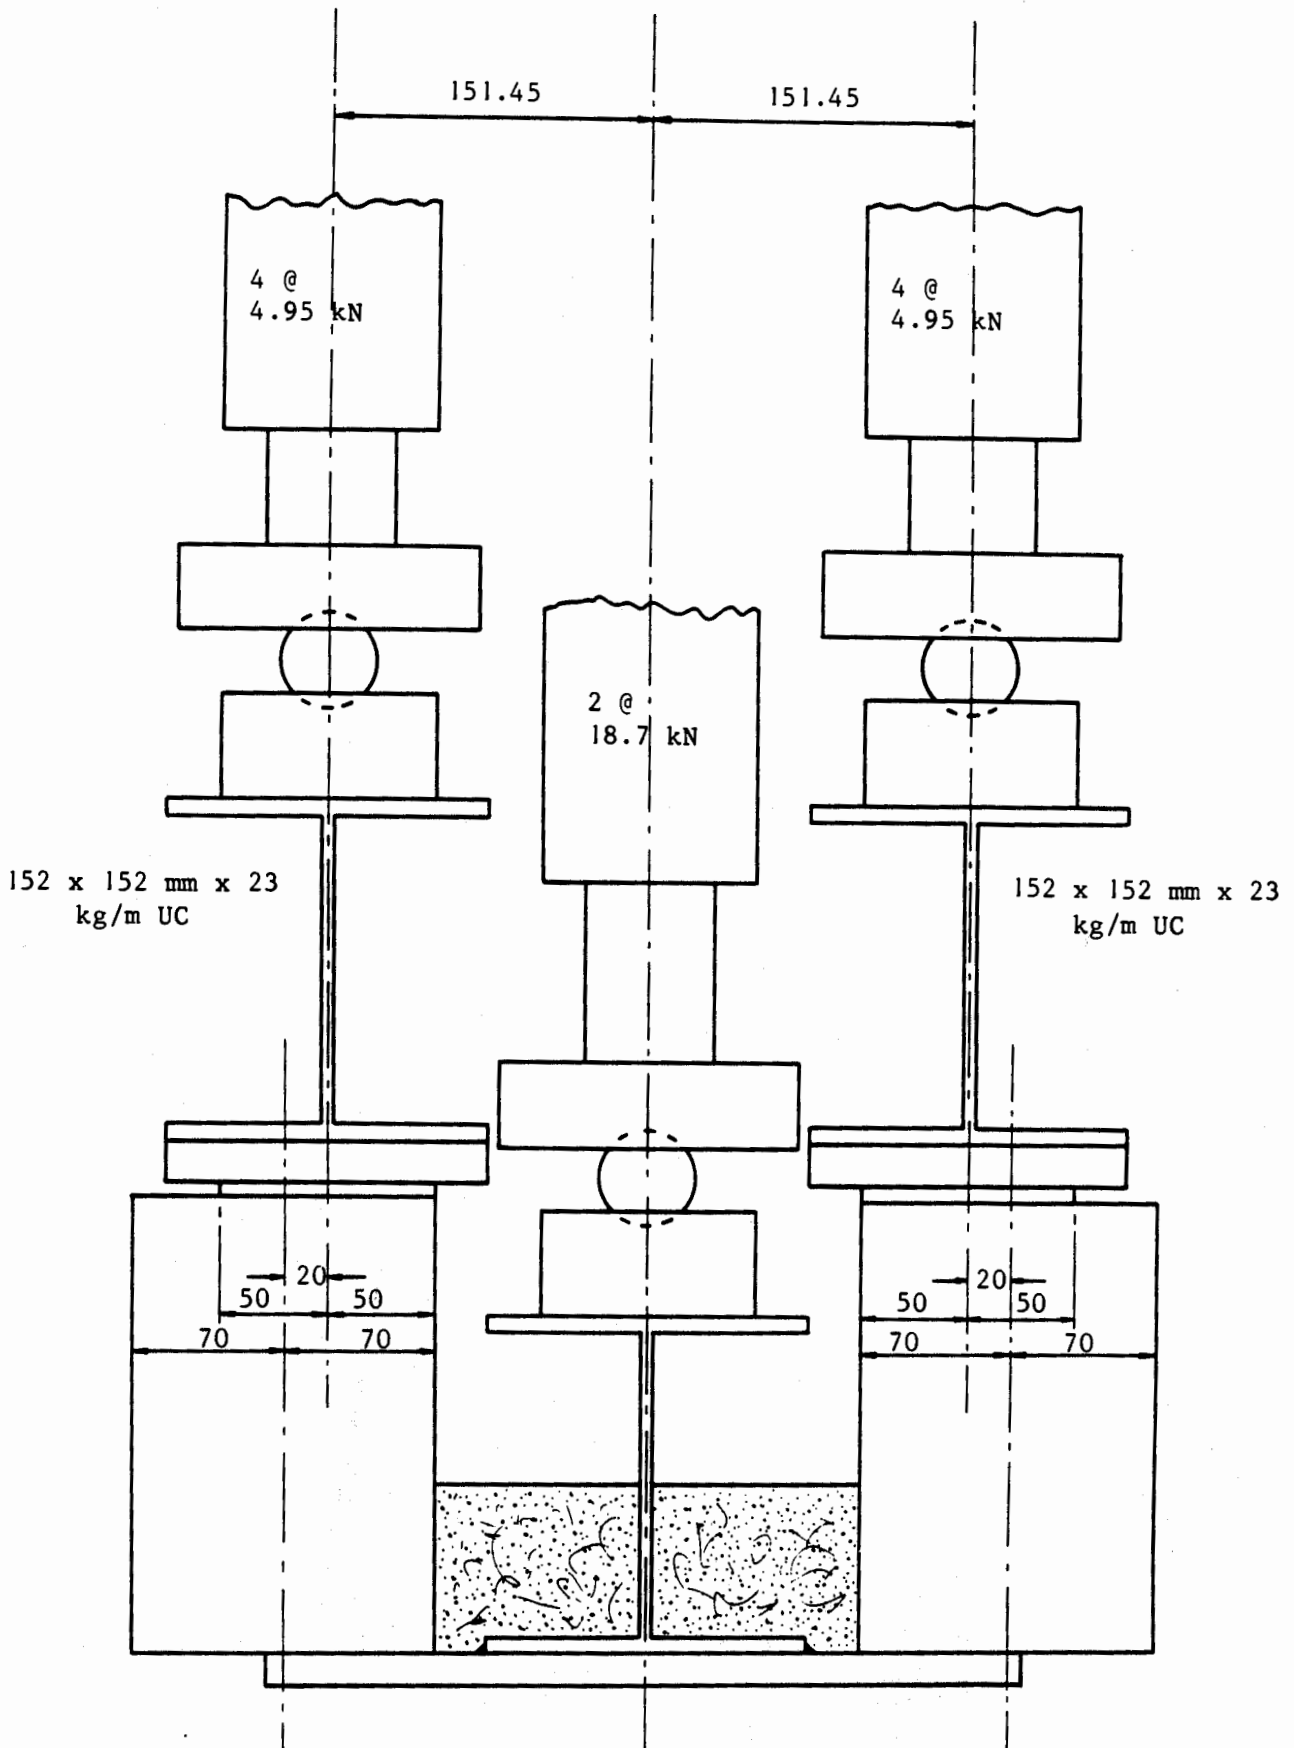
APPLIED LOAD POSITIONS - TRANSVERSE ARRANGEMENT - TEST NO. WFRC 54278 (R4/48)
